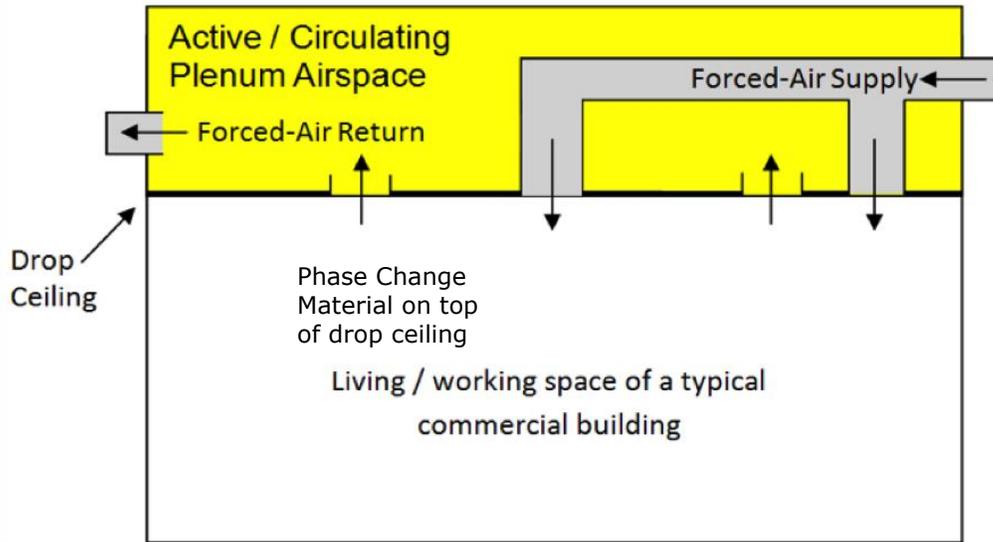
SCHEMATIC OF GENERAL AIRFLOW OF A SPACE WITH A CEILING RETURN AIR PLENUM
